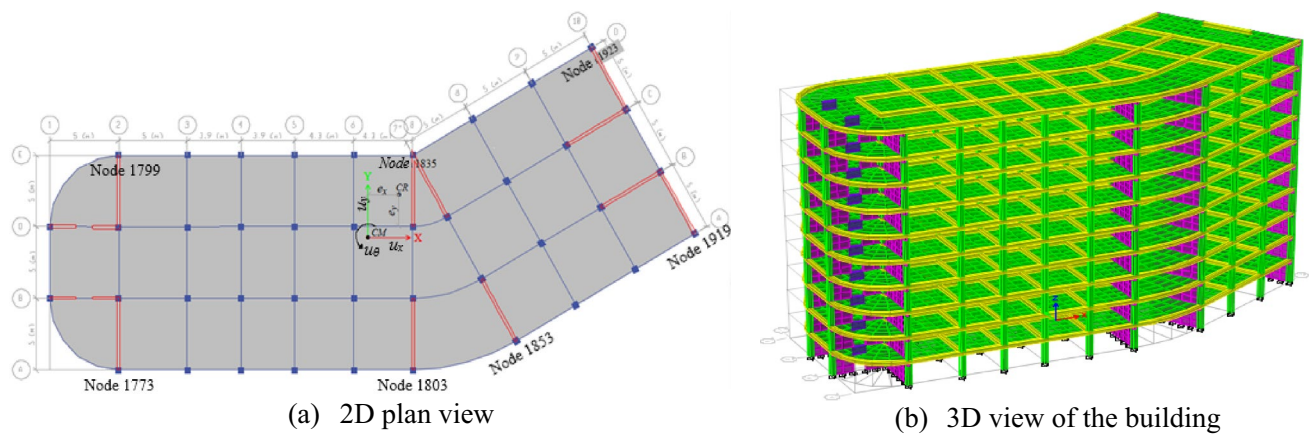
10-story frame-Shear wall irregular structure a 2D plan view b 3D view of the building
